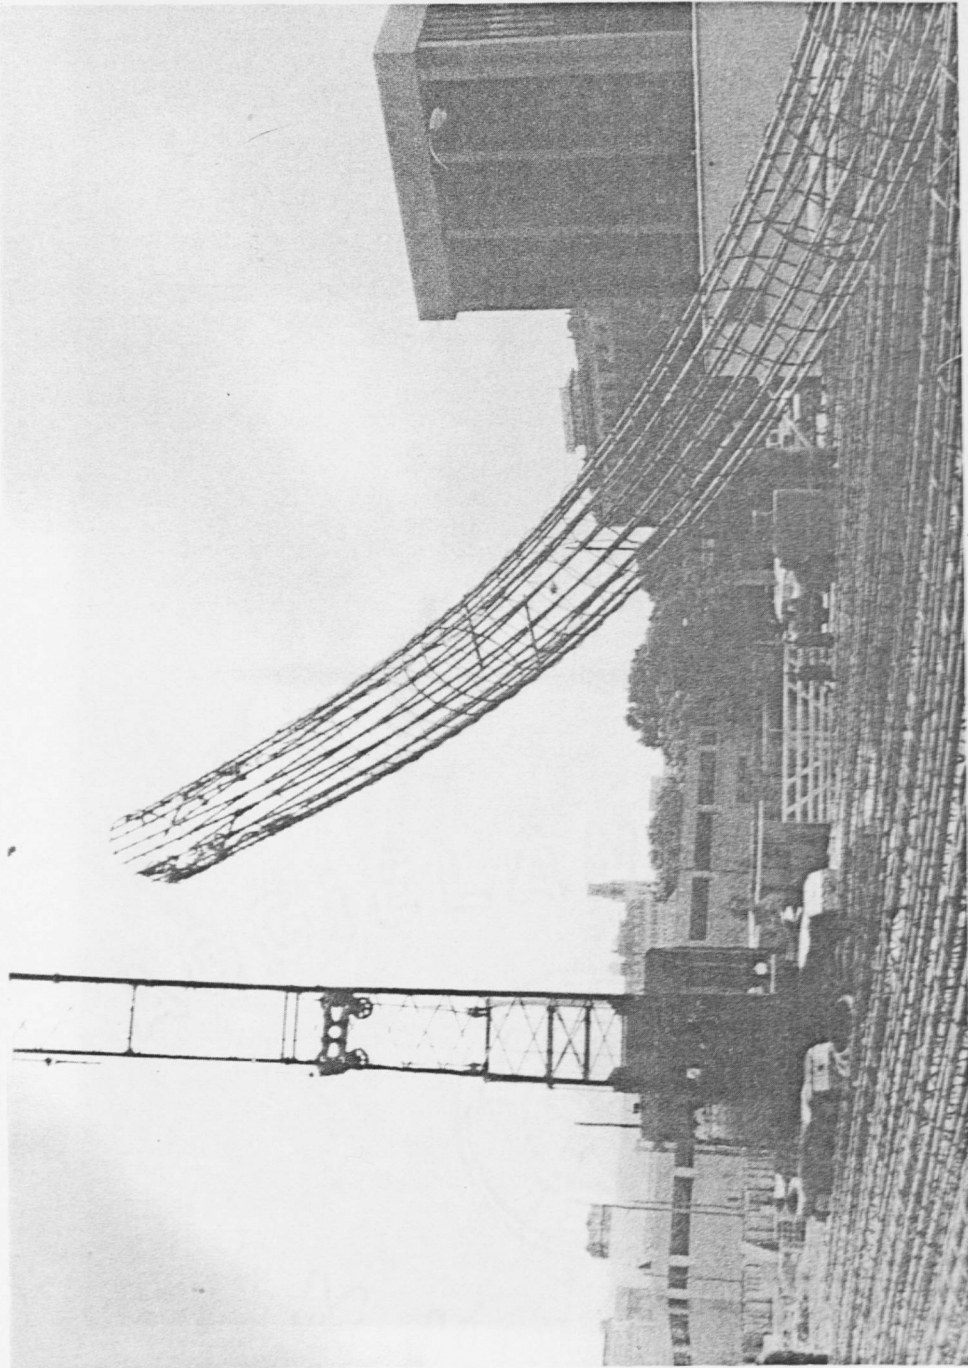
INSTRUMENTED REINFORCING CAGE BEING LIFTED
